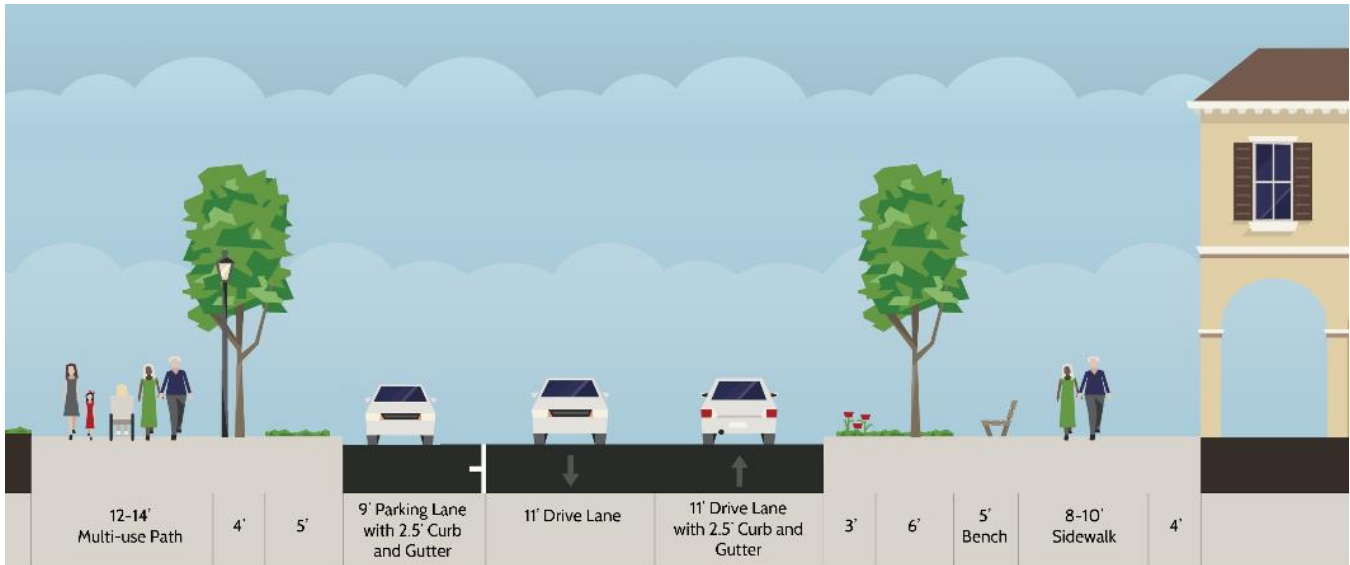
Proposed Typical Section for Collector Road in Activity Center with Multiuse Path
